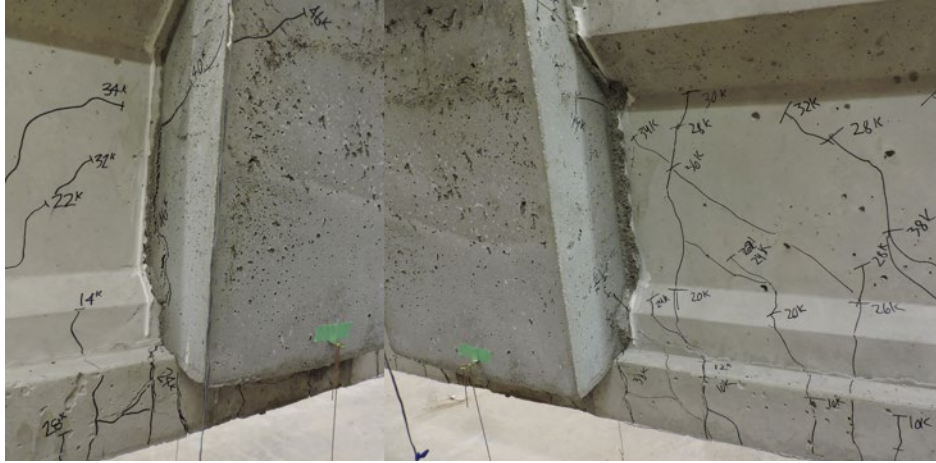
Specimen R3-PHOS girder-joint interface and joint transverse face cracking from the front left (left) and front right (right)
